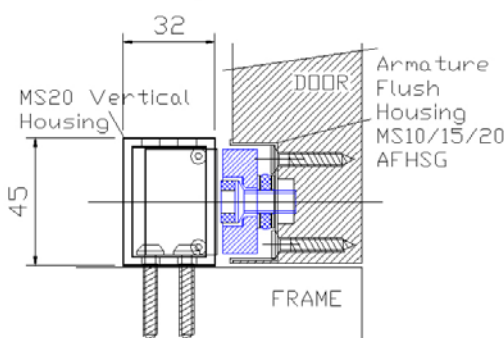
Inward / Outward opening doors with wide (45mm min.) stop post or frame.
